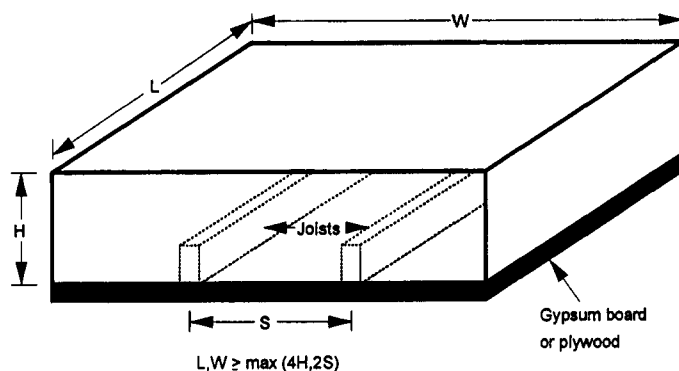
Requirements on Dimensions of Test Specimen Metering Area
